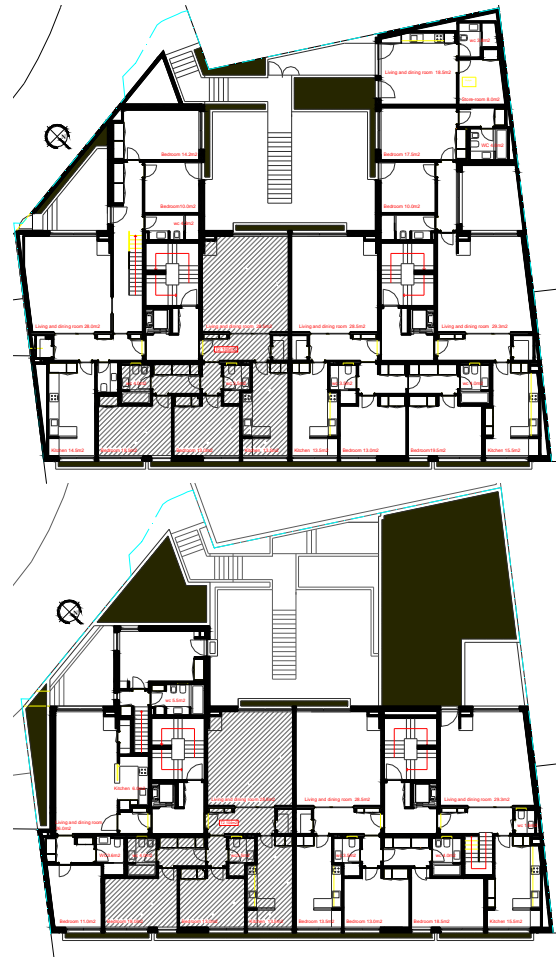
Schematic plan of the 1st and 2nd floor of the multifamily building studied
